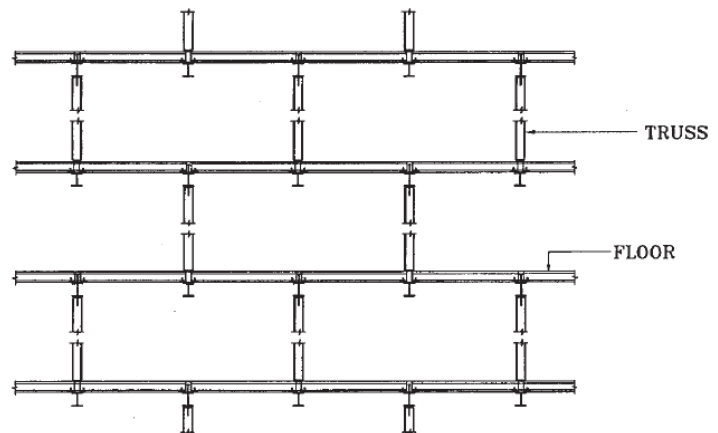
Staggered Truss System Vertical Staking Arrangement from AISC Design Guide 14
